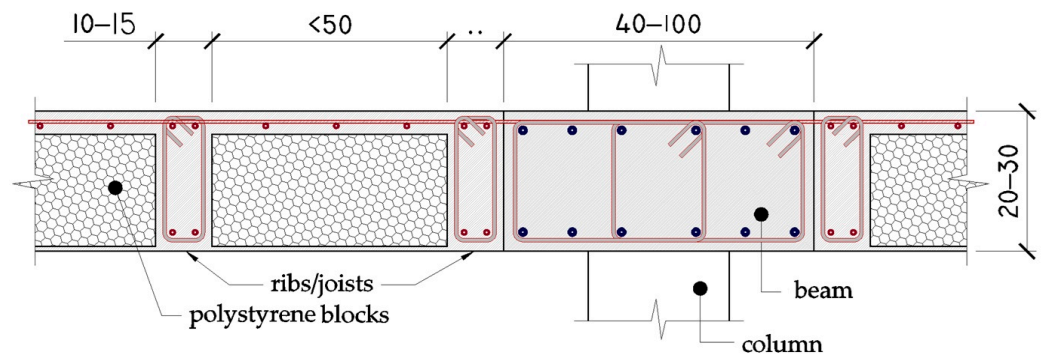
Typical detail of a wide beam and joisted slab used in Albania [229].
